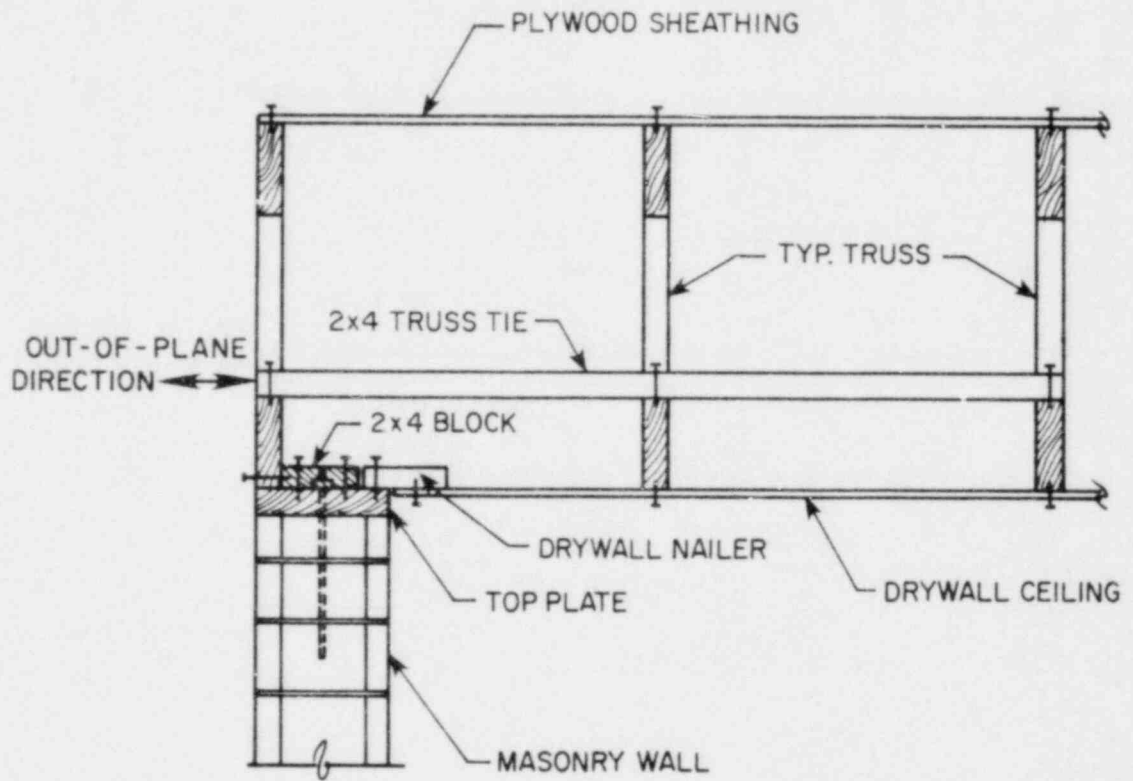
SECTION AT THE GABLE END OF A TRUSS ROOF
